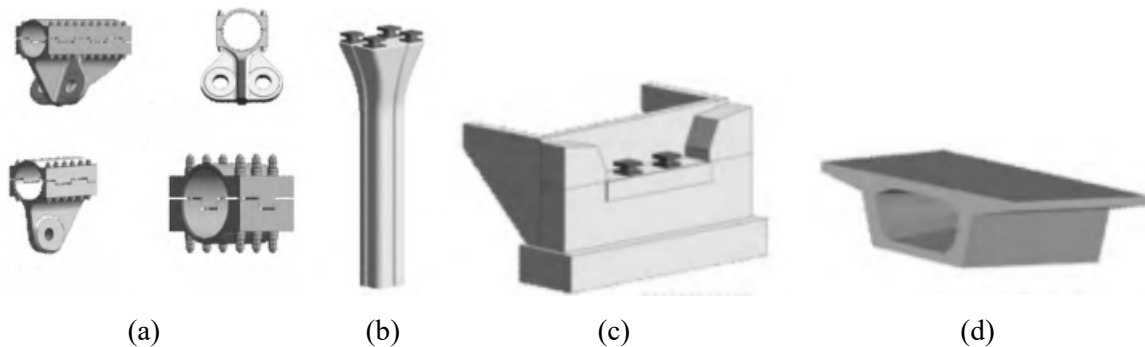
Parameterization warehouse component. (a) Rope clip; (b) Pier; (c) Abutment; (d) Standard section of main beam [7].
